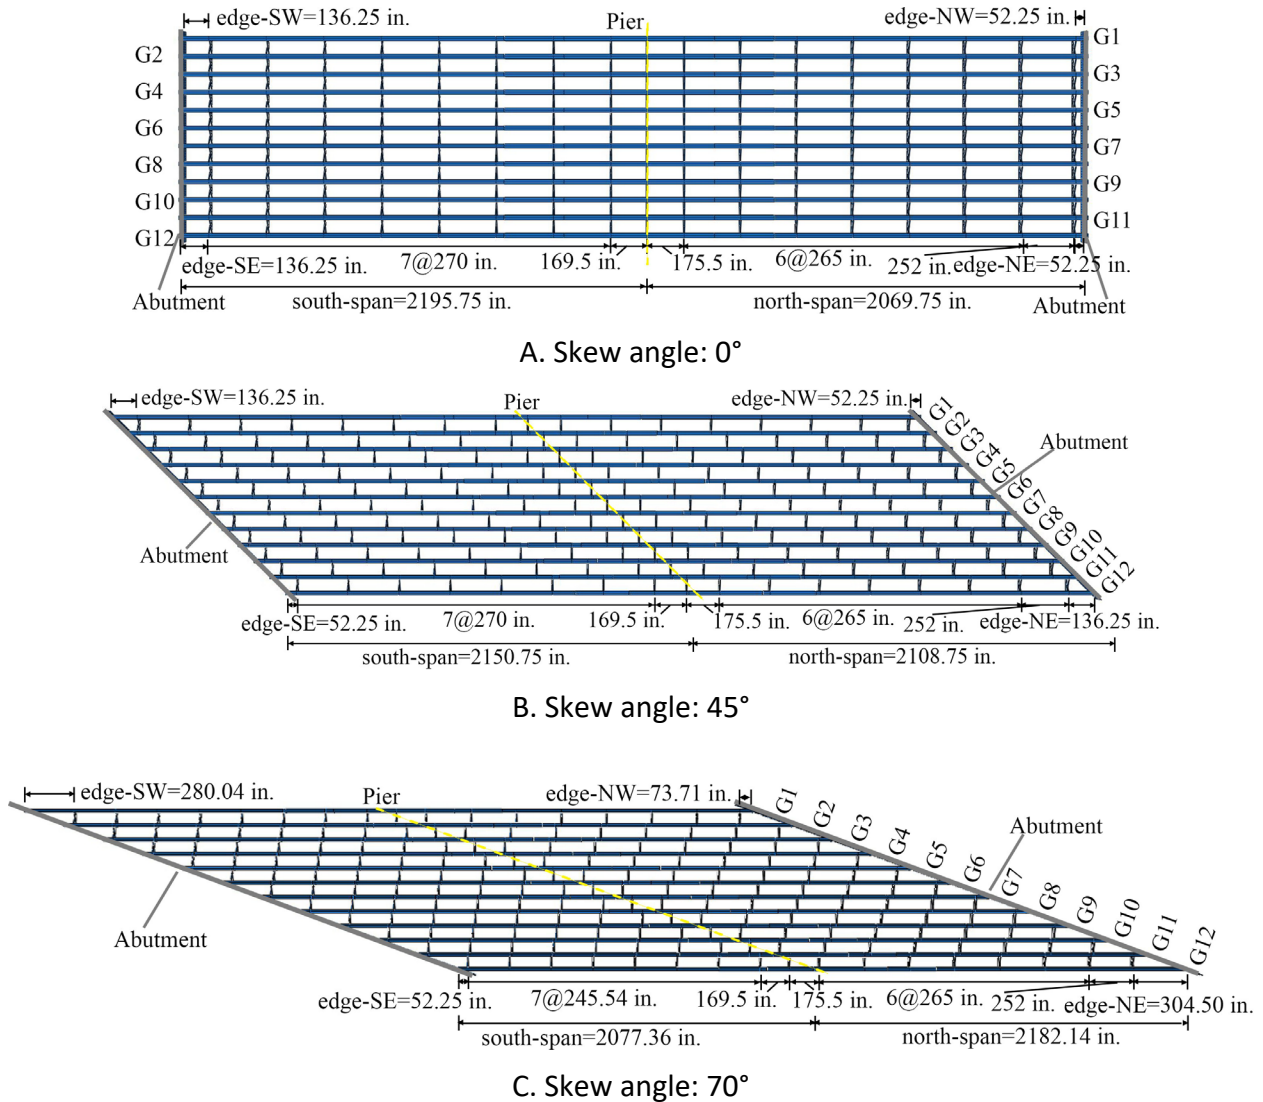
Plan view. Geometry of integral abutment bridges with skew variation.
